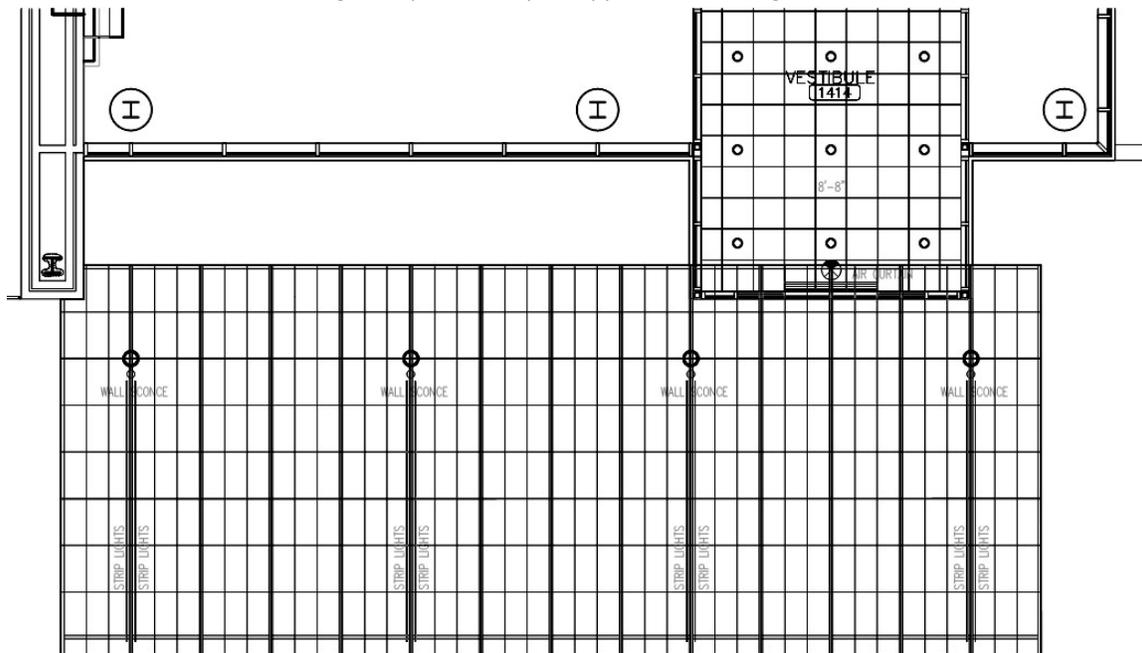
| Main Entry Canopy Reflected Ceiling Plan
